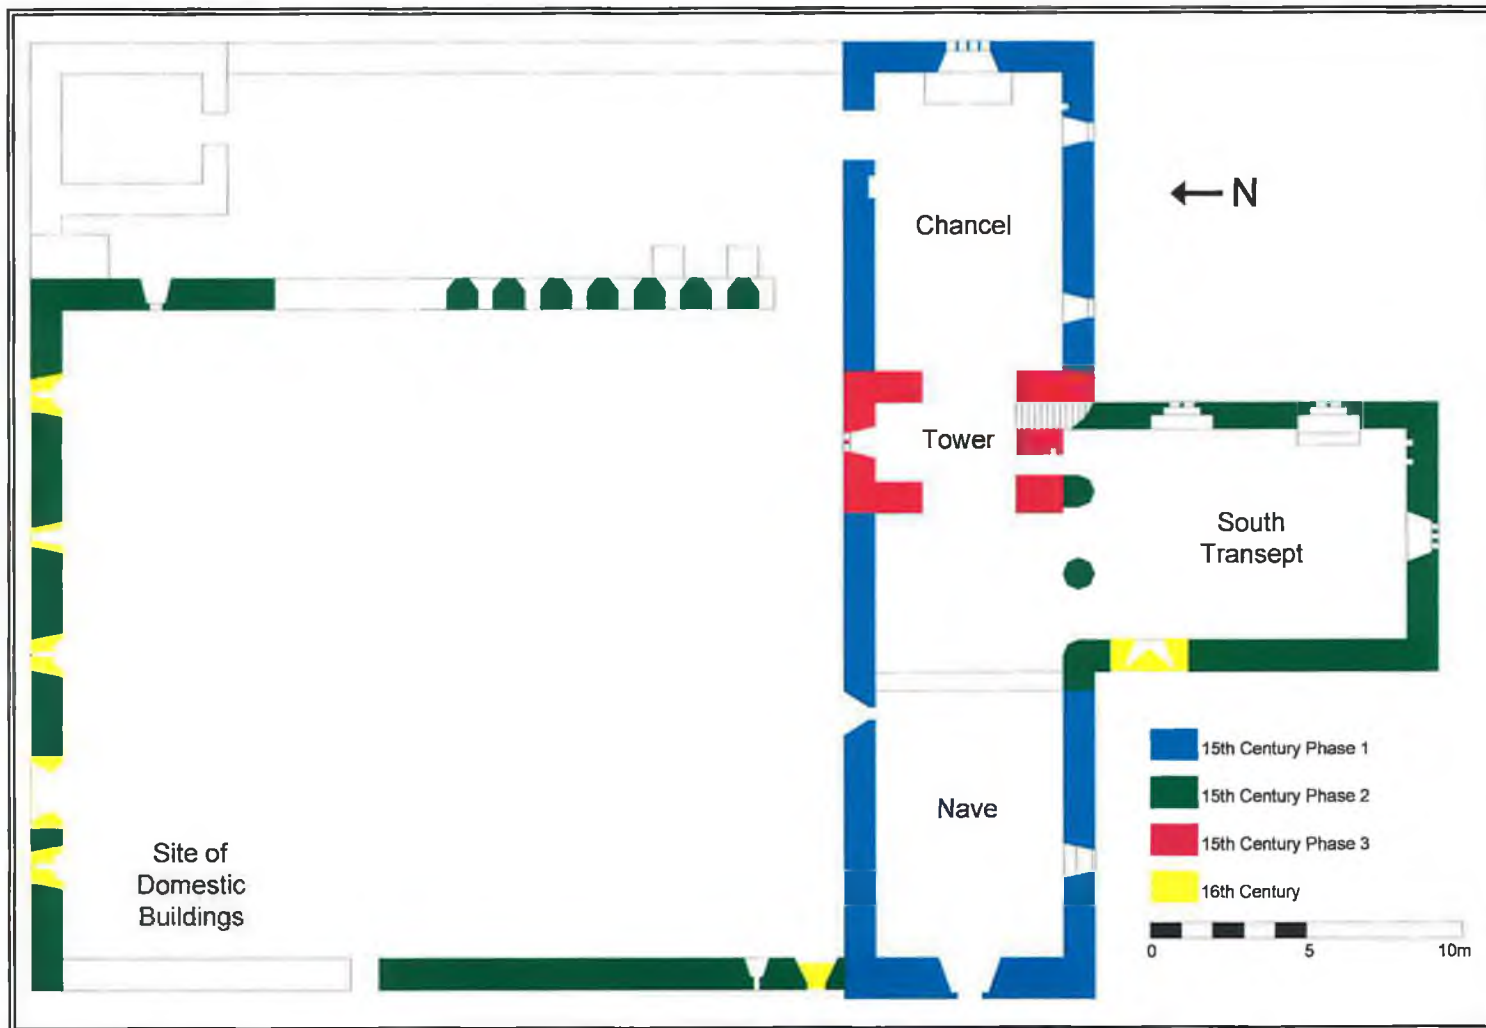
Plan of Burrishoole Friary (redrawn after on-site plan)
